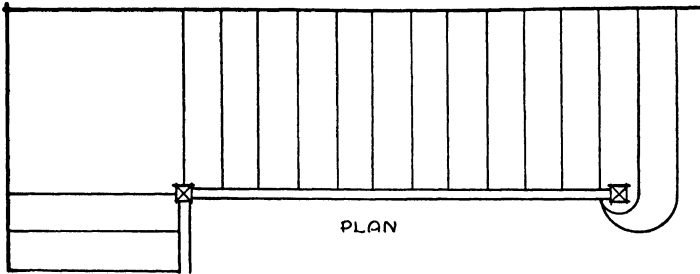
Plan of Stair with Newel on the Second Stair Tread
